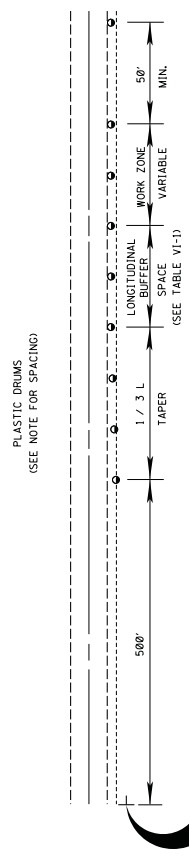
DETAIL OF DRUM PLACEMENT AT PAVEMENT EDGE DROP-OFF
